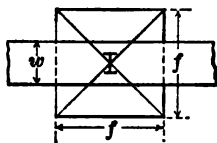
Square Supporting Area. Wall and Concentric Isolated Load
